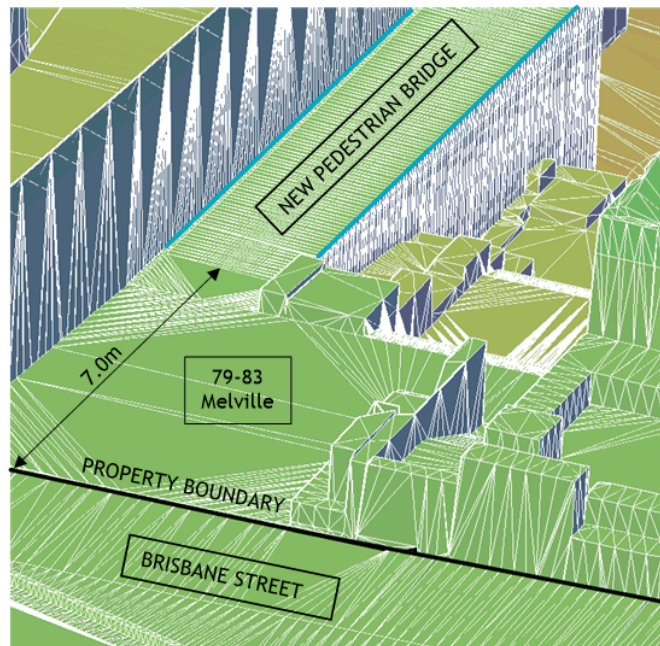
3D View of New Surface with the Pedestrian Bridge through the Site for HEC-RAS Site Model
